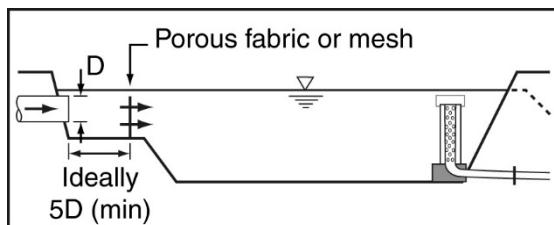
(b) – Typical layout of inlet chamber with opposing inlet pipe (Type C basin)
